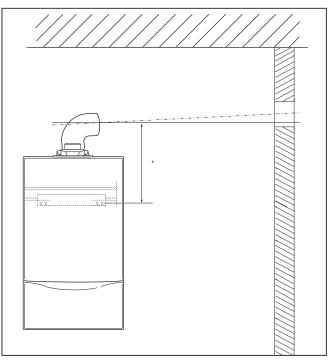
Distance between hanging bracket and wall breakthrough
